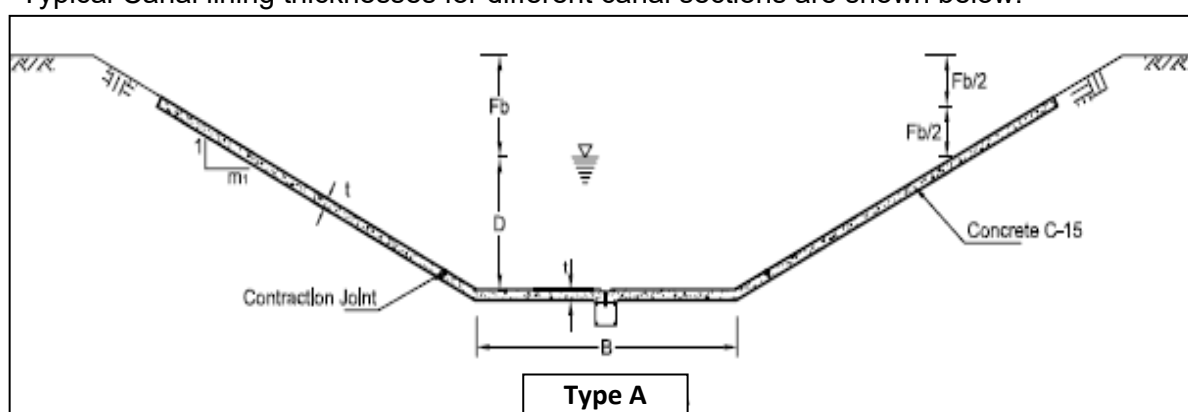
Concrete lining thickness for typical trapezoidal canal section (Type-A)
